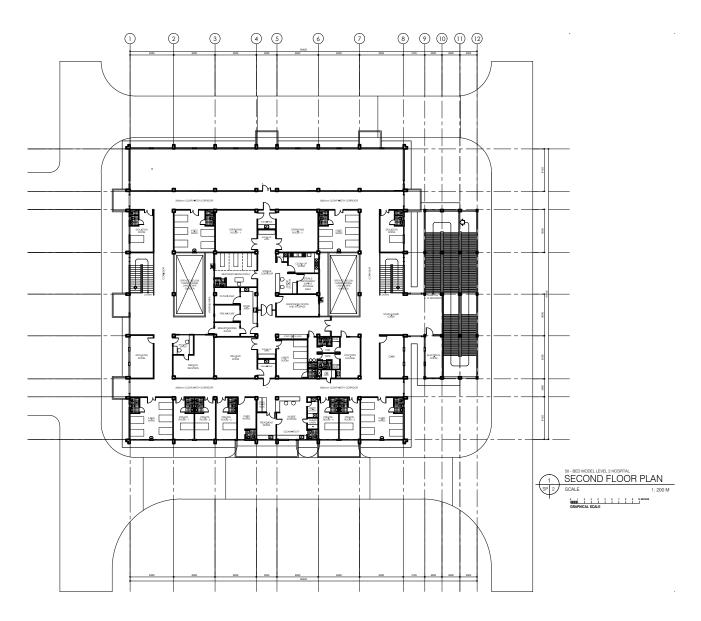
Two-Storey, 25-Bed Hospital Level One: Second Floor Plan
